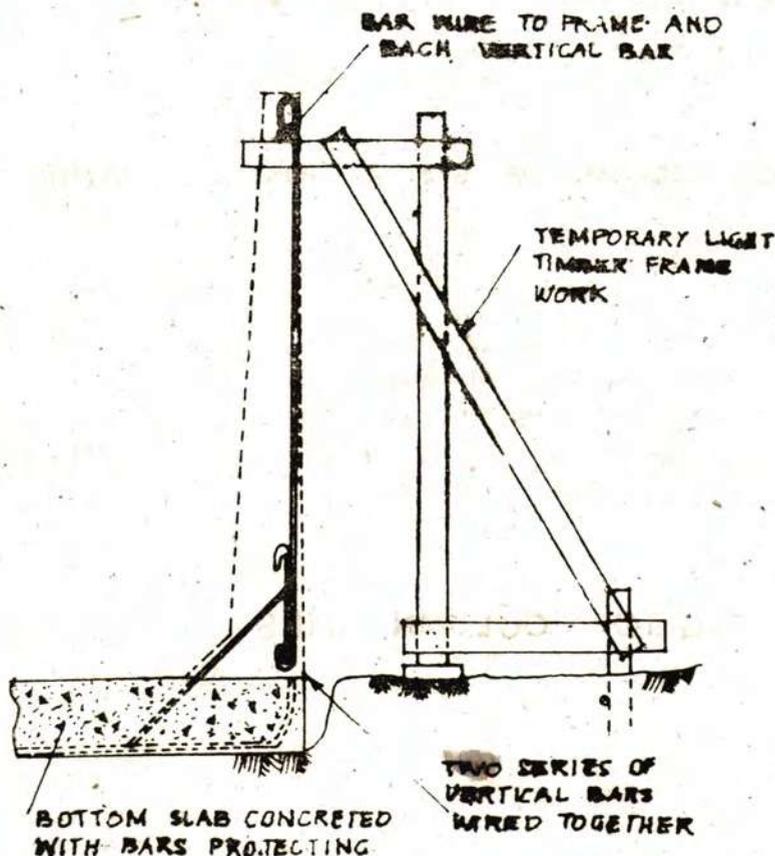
SUPPORTING VERTICAL WALL REINFORCEMENT
